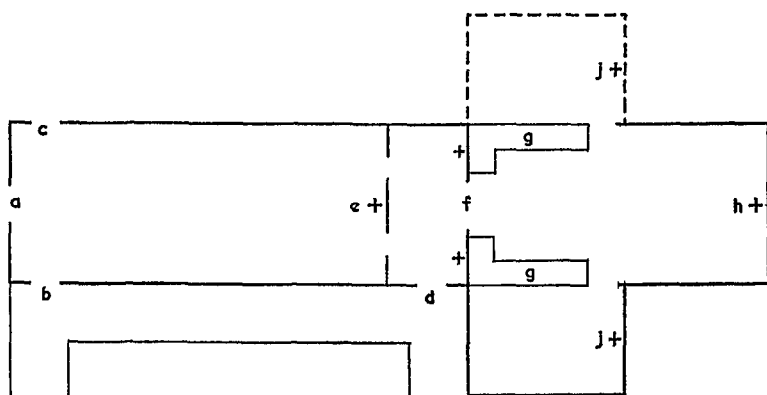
Diagrammatic plan to illustrate the probable internal arrangement of church and position of doorways. (a) West door. (b) Door from cloister. (c) North door suggested by Thorpe's drawing. (d) Door from cloister. (e) Altar against rood screen, flanked by openings. (f) Entrance through quire screen, flanked by altars. (gg) Nuns' stalls. (h) High altar. (j) Altars of transept chapels.
